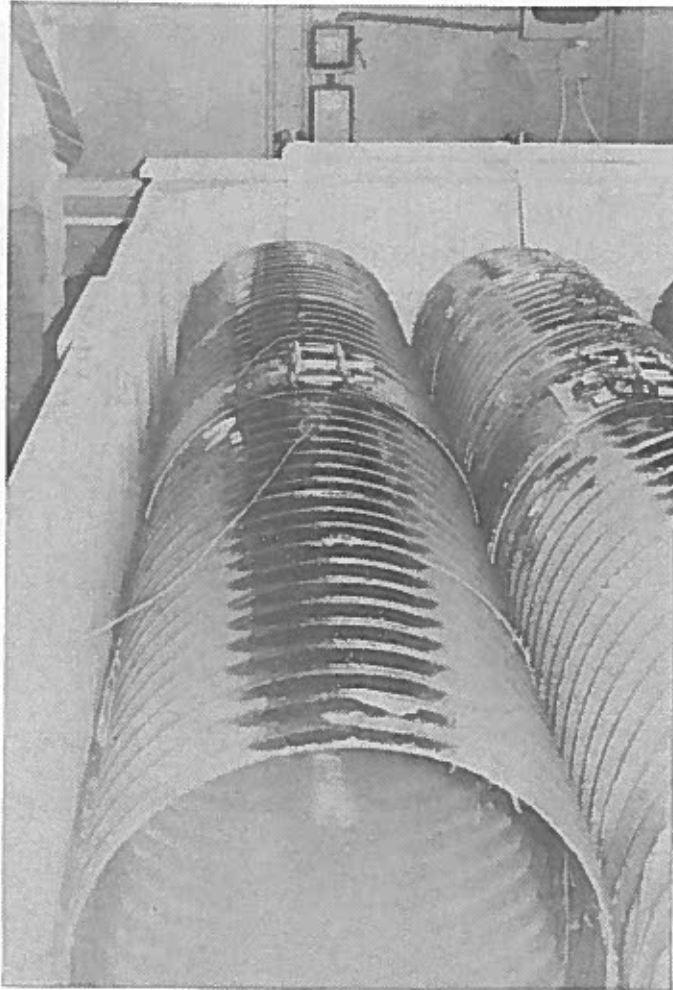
This is the fiber-bonded bituminous galvanized culvert immediately after testing.
